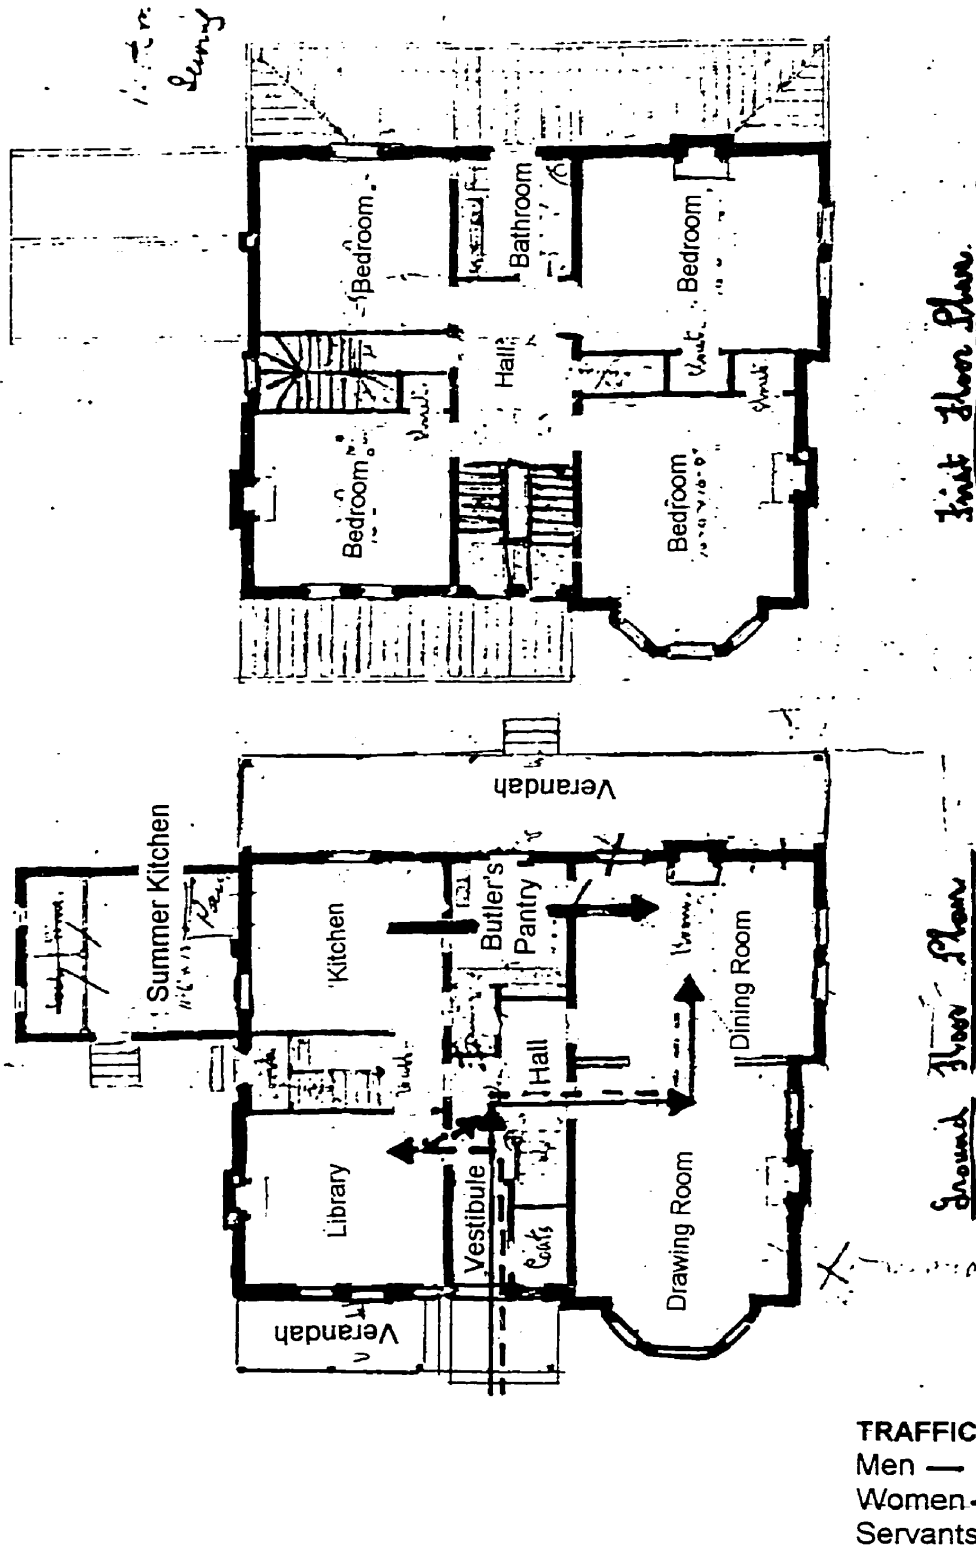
272 Park Street. Ground Floor. Architectural Plans, Aug., 1881
